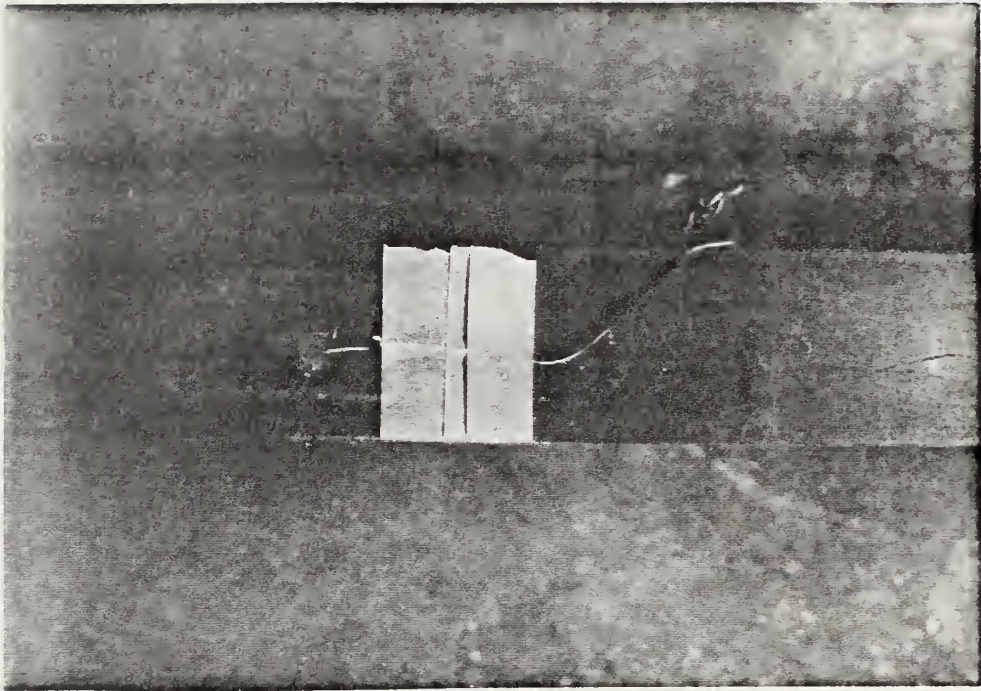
, Strain Gage Installed on Concrete and Steel Face of Beam III.
